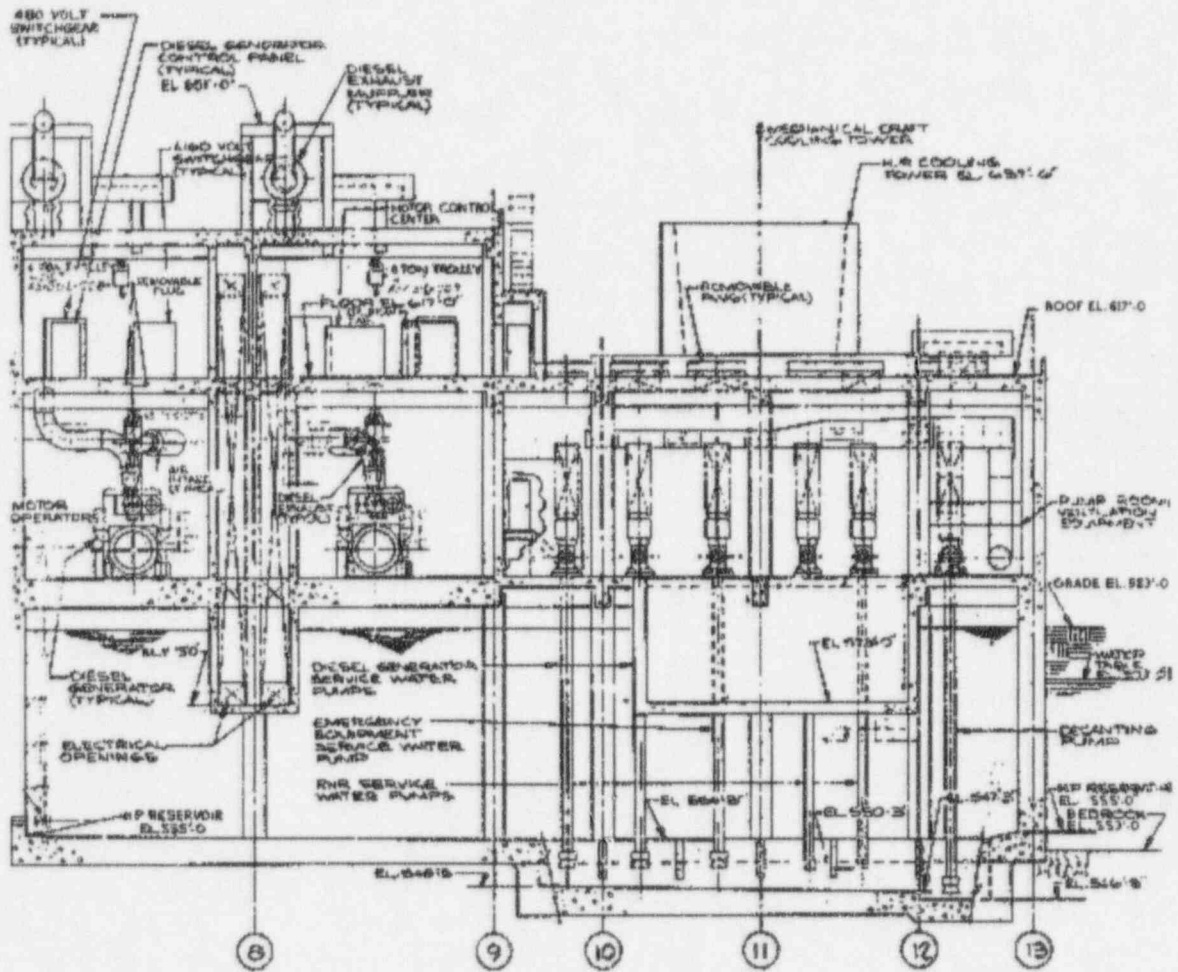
RHR Building Section Through EDG Rooms Looking West
